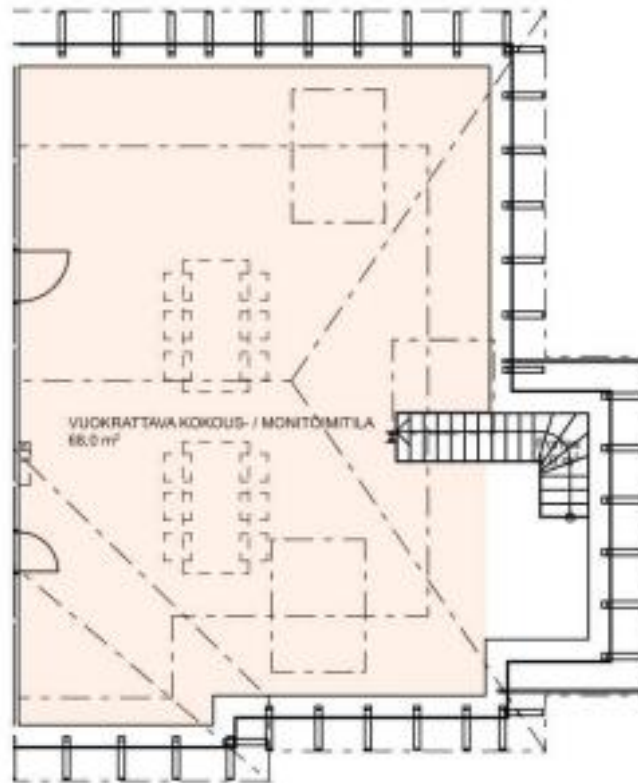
Second-floor multi-purpose space for rent (not to scale)
